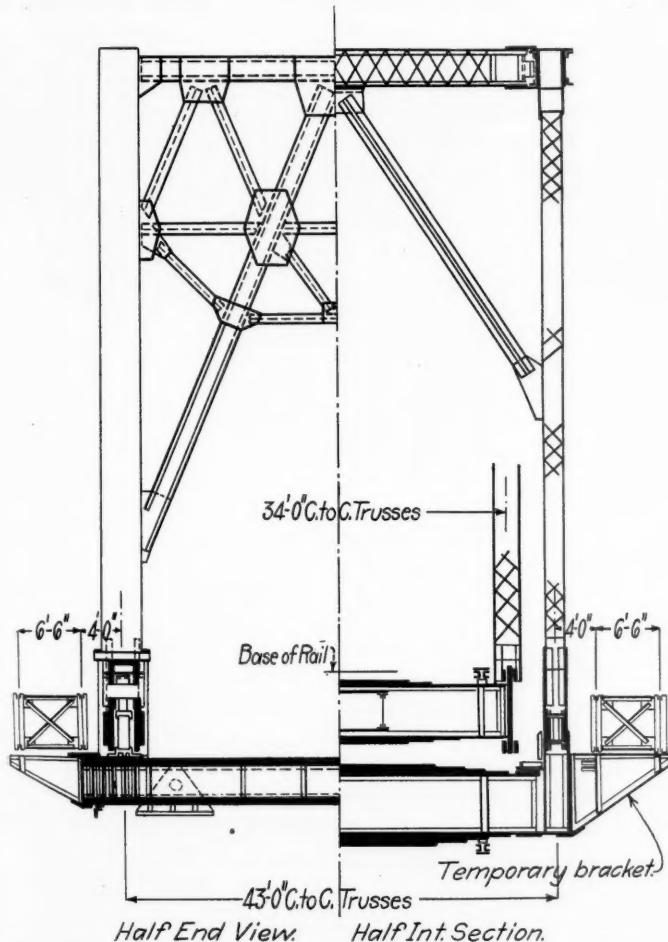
Elevation and Section Showing Relation of New Bridge to Old and the Temporary Material Tracks Outside of Trusses.
